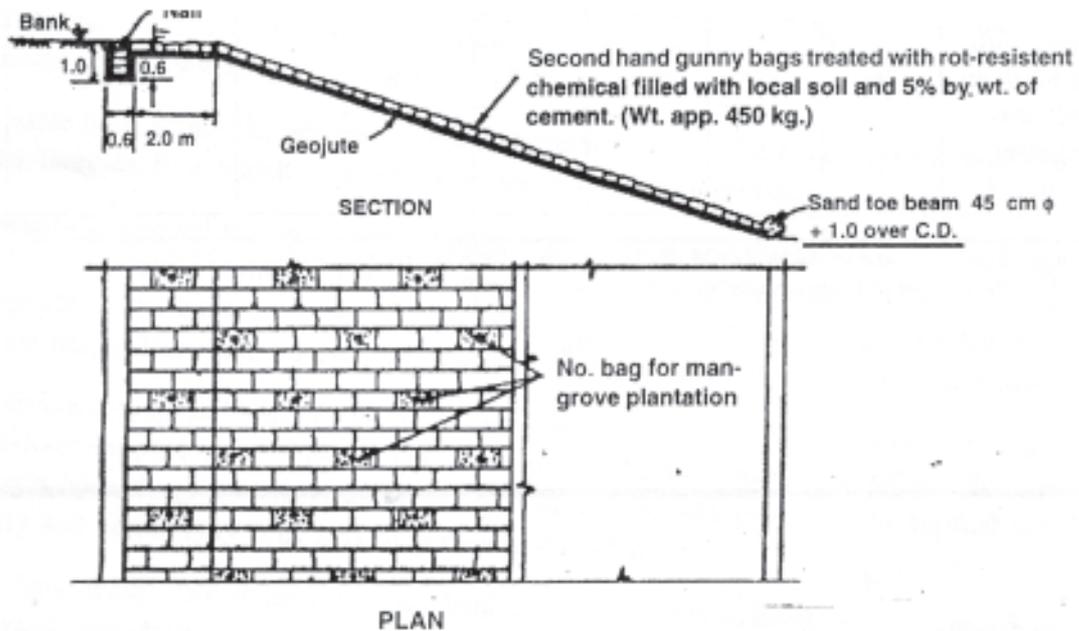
Typical Sectional Elevation & Plan for bank protection & mangrove plantation (Gunny bag type)
